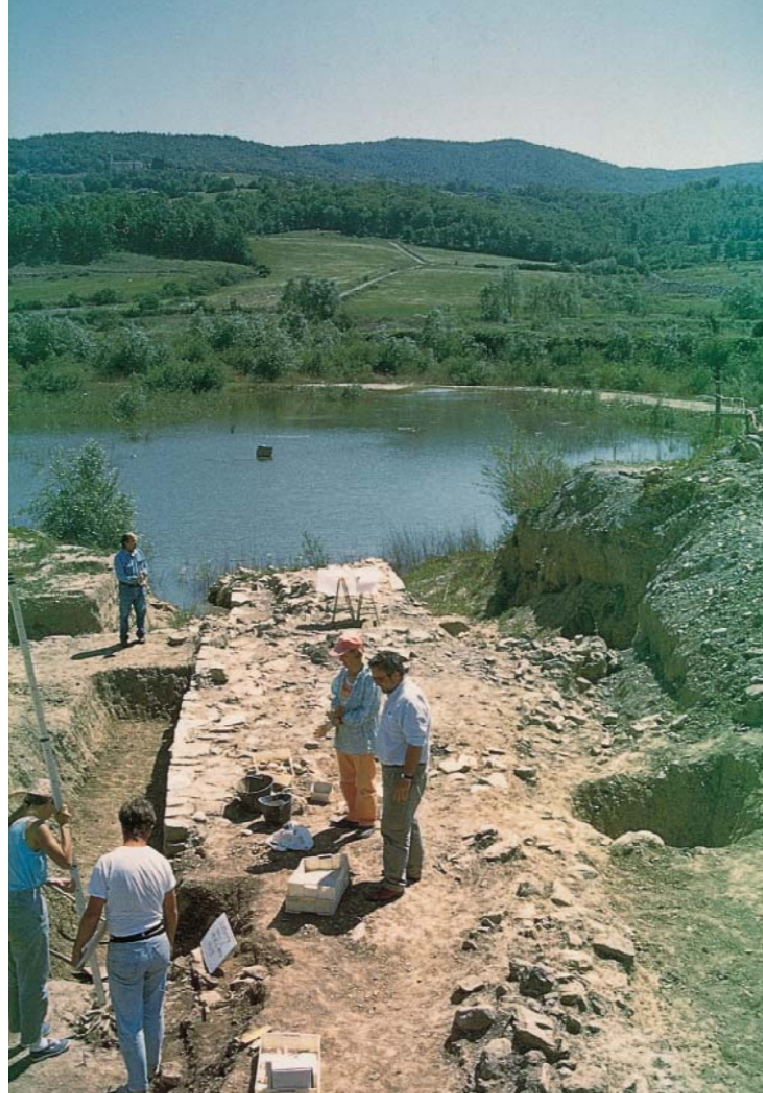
Colombaiotto bridge. Left abutment (north): downstream view of the abutment with the start of an arch and three cavities on the level of the springers.
